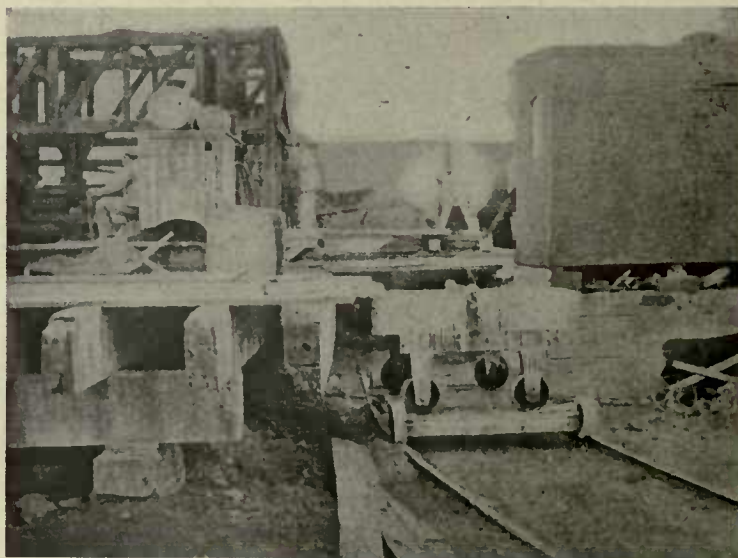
HOPPER CAR FOR MOULDED PILES.
